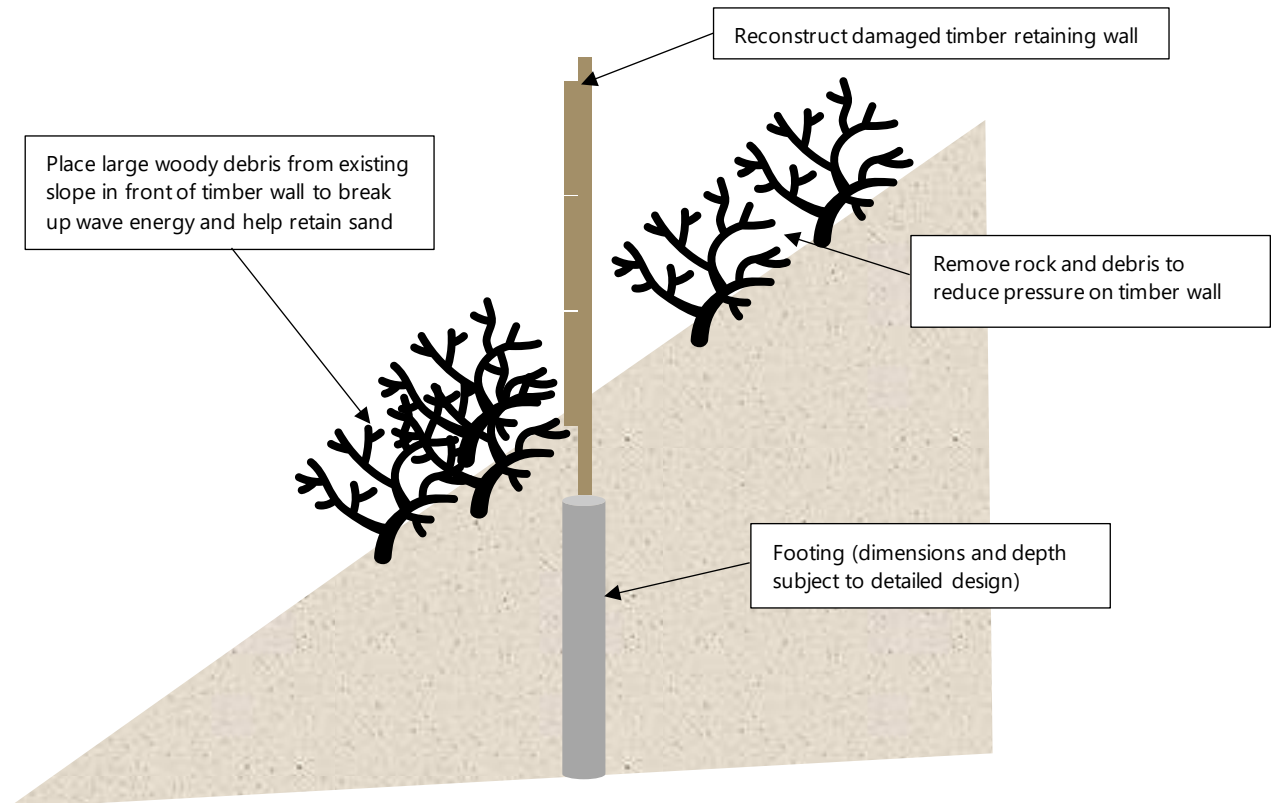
Concept for repair of existing timber toe retaining wall
